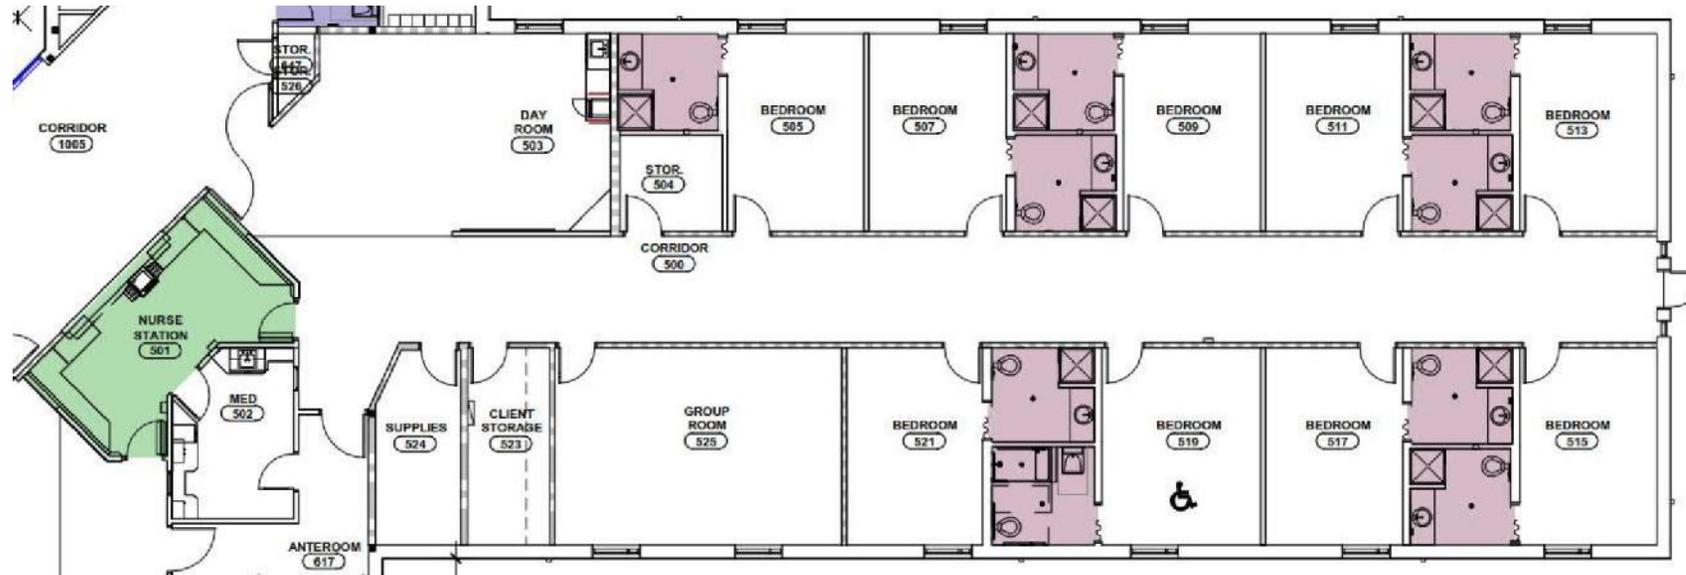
18-Bed Female Adolescent PRTF Unit Floor Plan
